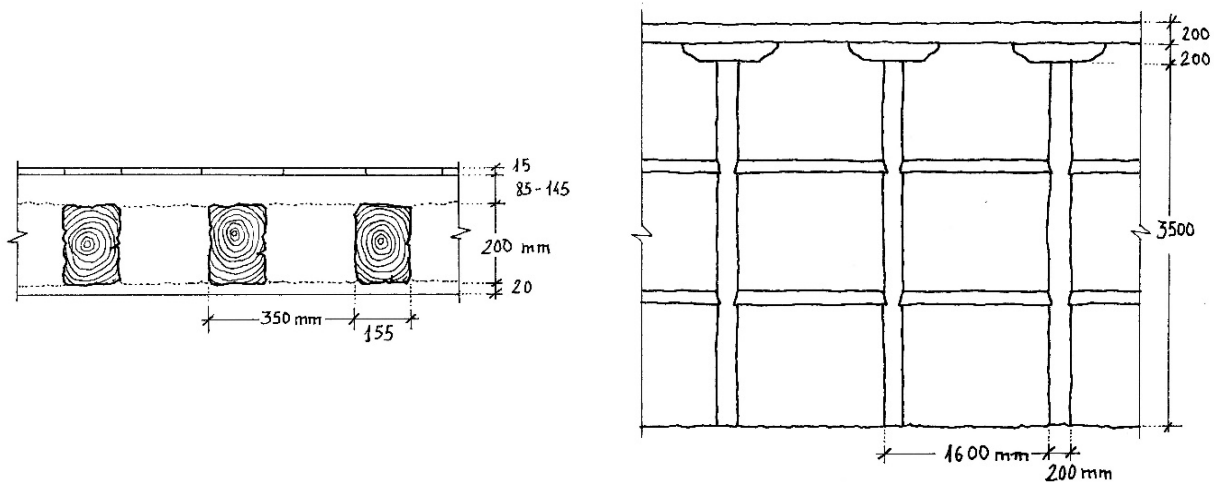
Floor slab cross-section (left) and framed wall elevation (right).
